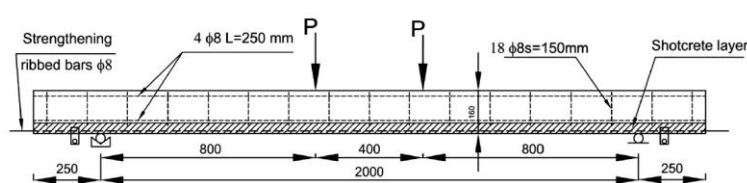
Drawing of Beams No. 9-11, all dimensions are in mm.
